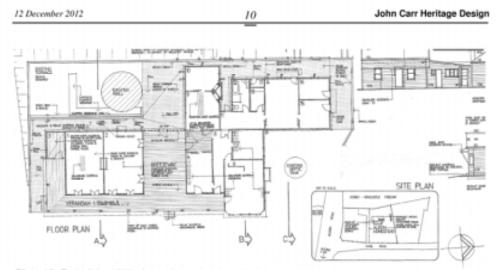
Part of the 1990 plans. (Suters Architects Snell)
